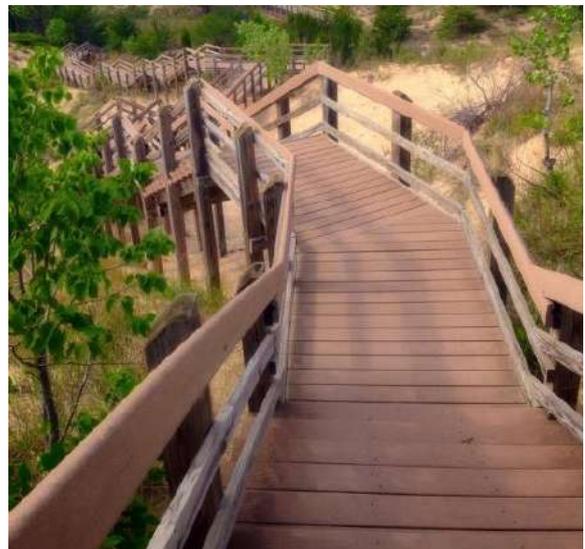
The envisaged characteristics of proposed wooden deck connecting Baby Point, Main Point and Pasarichenai Beach
